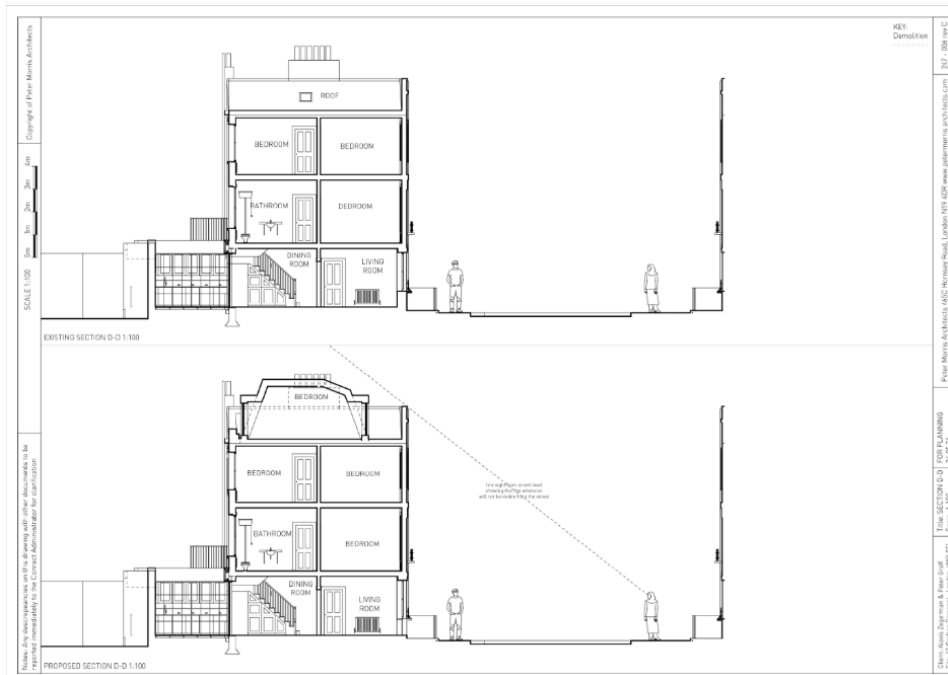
Existing (top) and Proposed section drawing of No. 13 Grafton Crescent.
